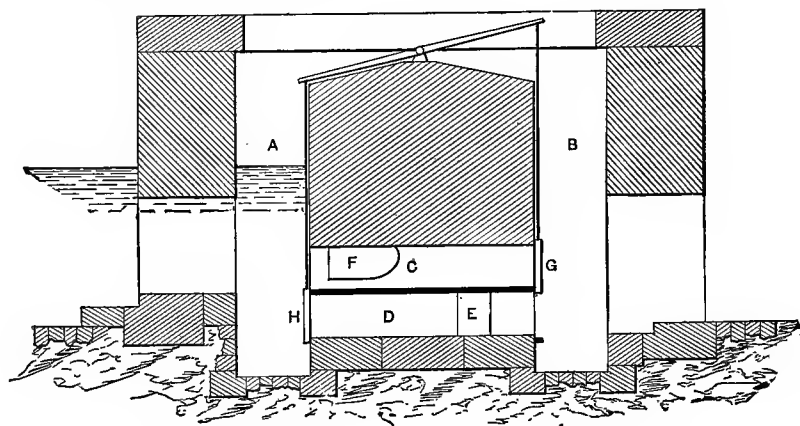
ABUTMENT OF DESFONTAINES DRUM-DAM.
